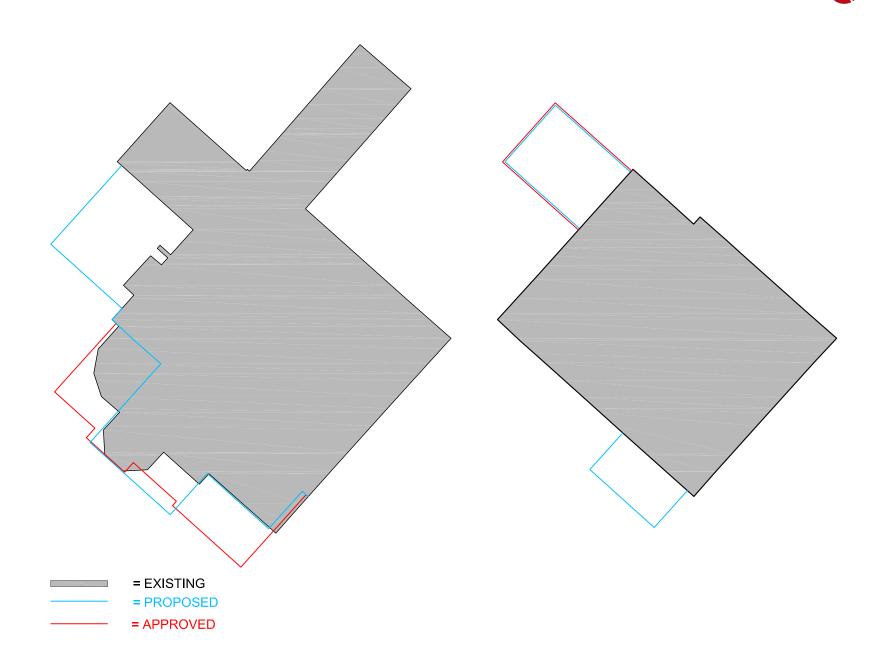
BURCHETT'S GREEN HOUSE THE BARN - EXISTING BUILD
